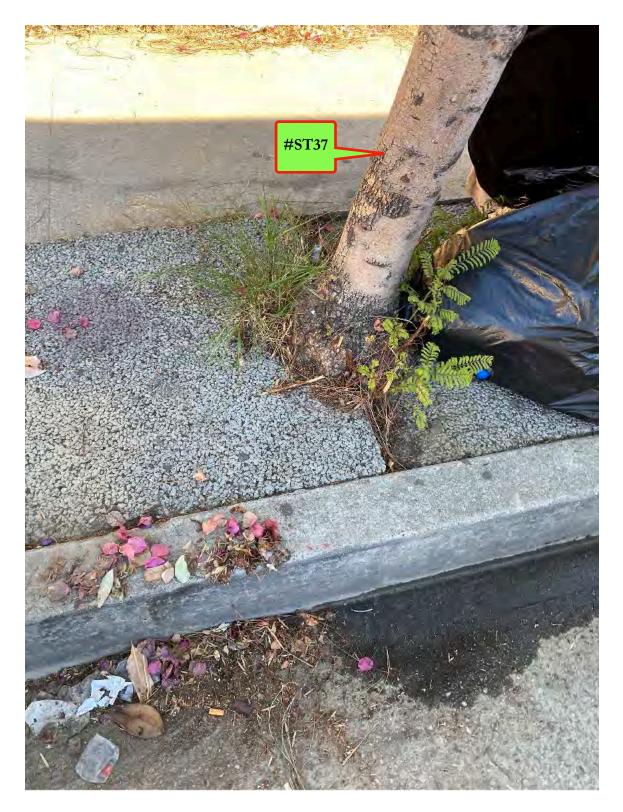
Jacaranda Tree #37 - To be removed.
